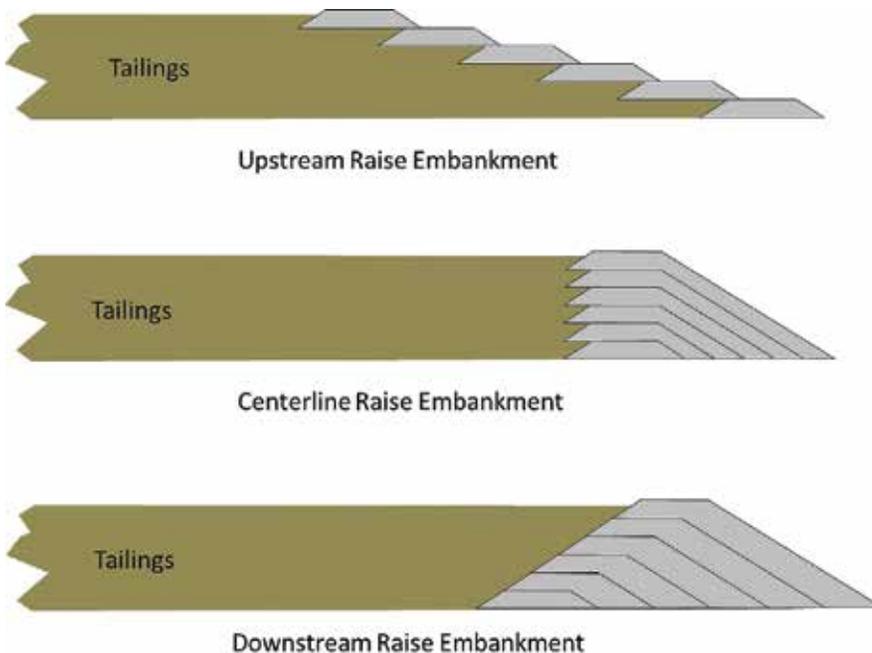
Primary methods to raise a TSF embankment. (Adapted from Vick, 1990).
